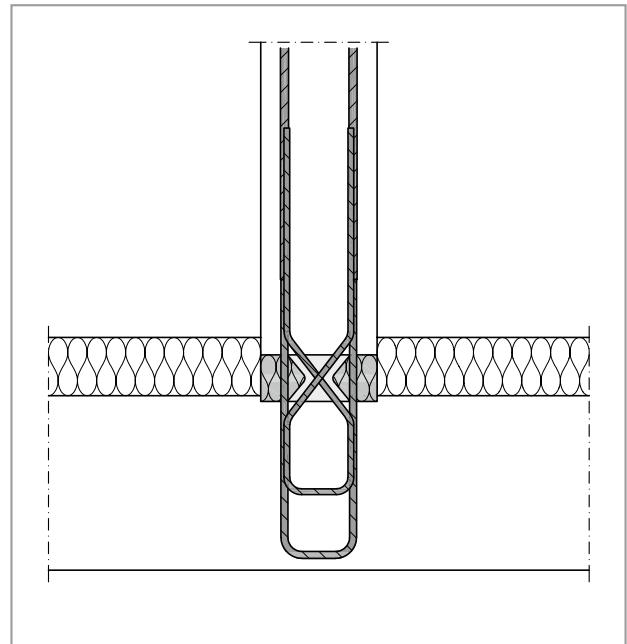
Schöck Sconnex® type W special tension element: Section E-E; suspension of a floor on a wall
